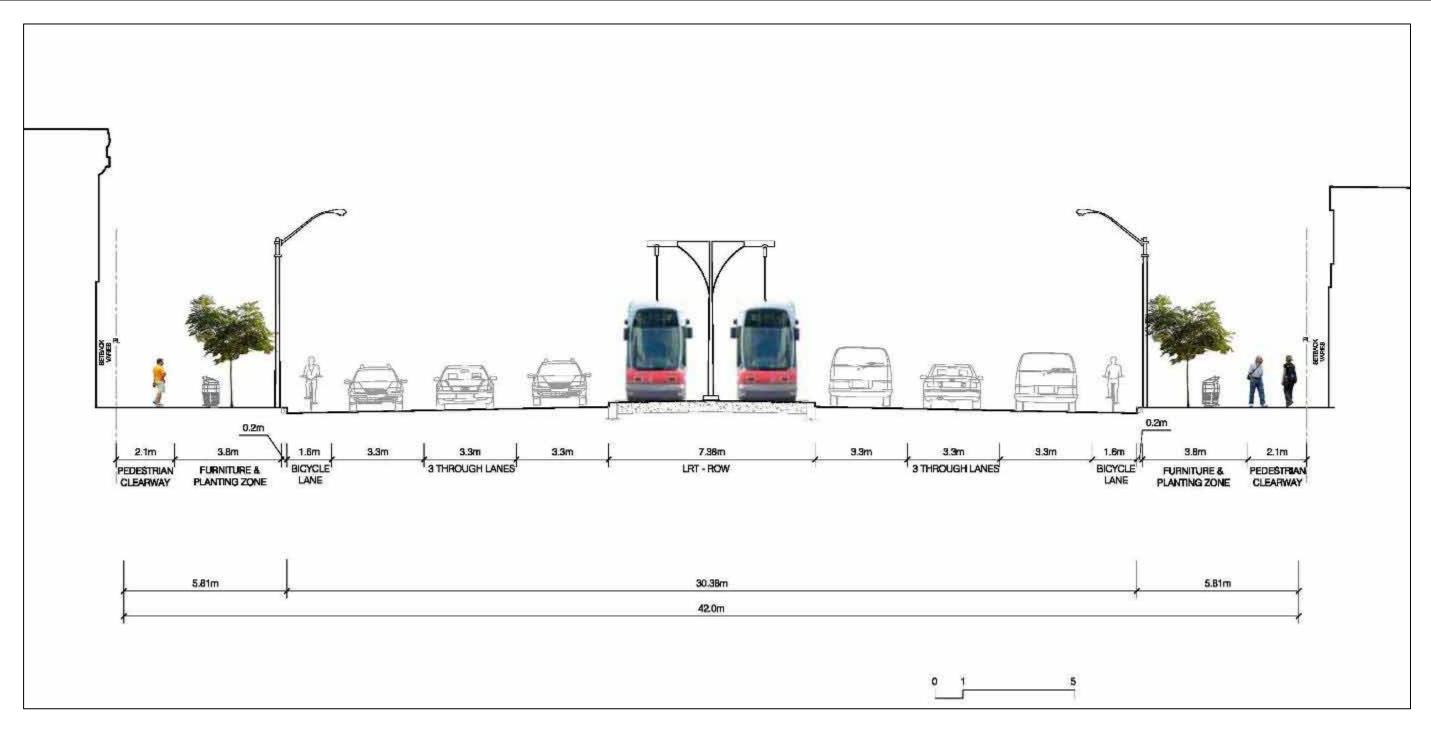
Typical Midblock Cross Section – 42m (Sector Jane St to Weston Rd.)
